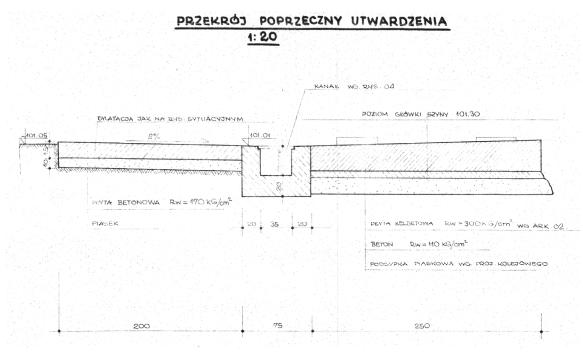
The design solution of the concrete railway subgrade-cross-section (based on archival project documentation)
